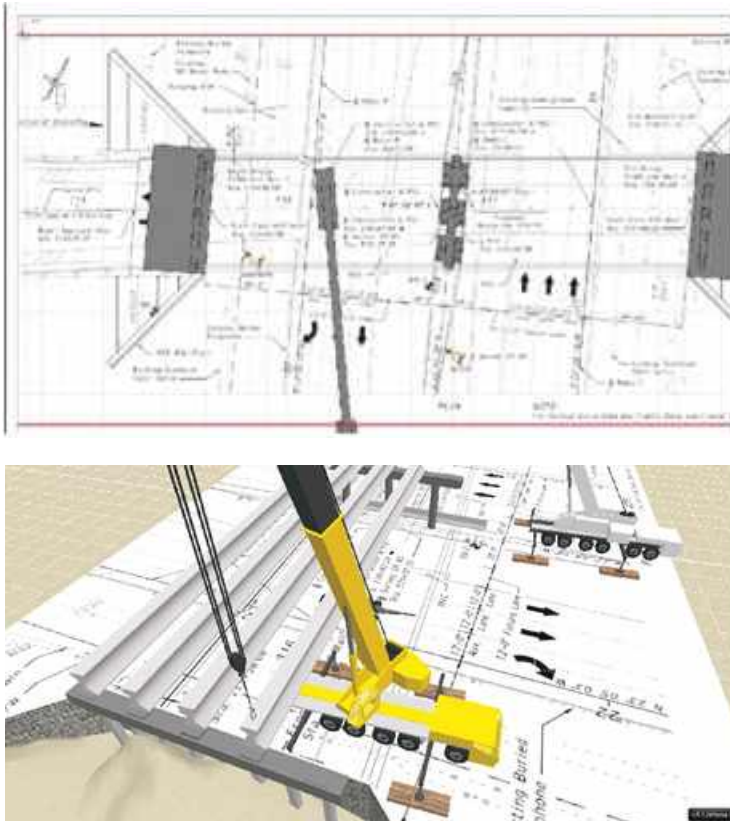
Positioning the crane: two-dimensional drawing with crane position. A three-dimensional representation of the crane location is shown below for clarity. Source: 3D Lift Plan.
